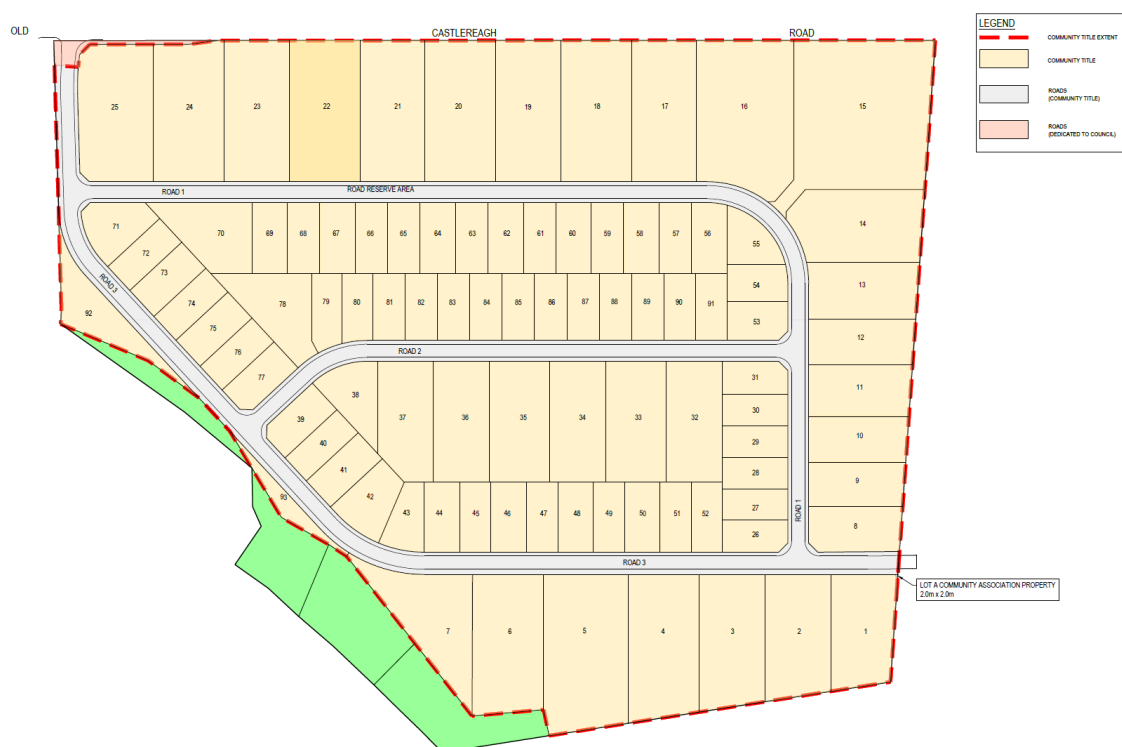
| CT Plan of Subdivision indicating private ownership of internal roads (Source: *Enspire Solutions*)
